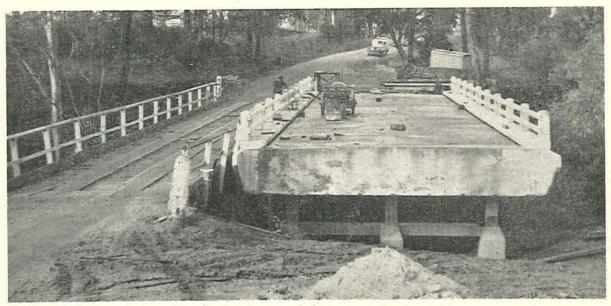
Construction of Concrete Bridge over Bass River on the South Gippsland Highway replacing old, narrow Timber Bridge.
